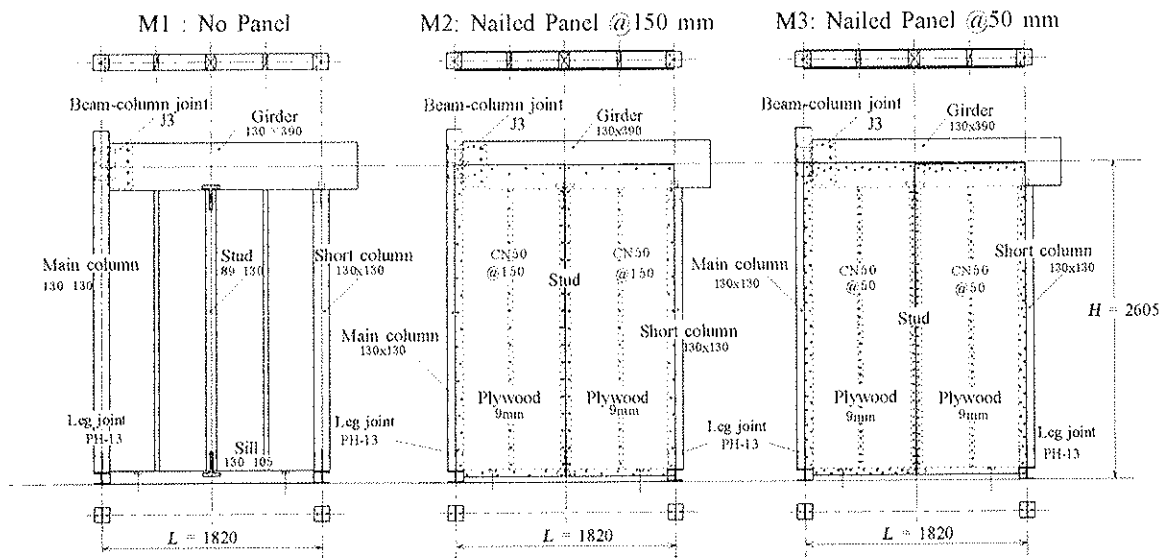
Details of test specimens ( $L = 1820$  mm, main column's cross section is 130 x 130 mm).
